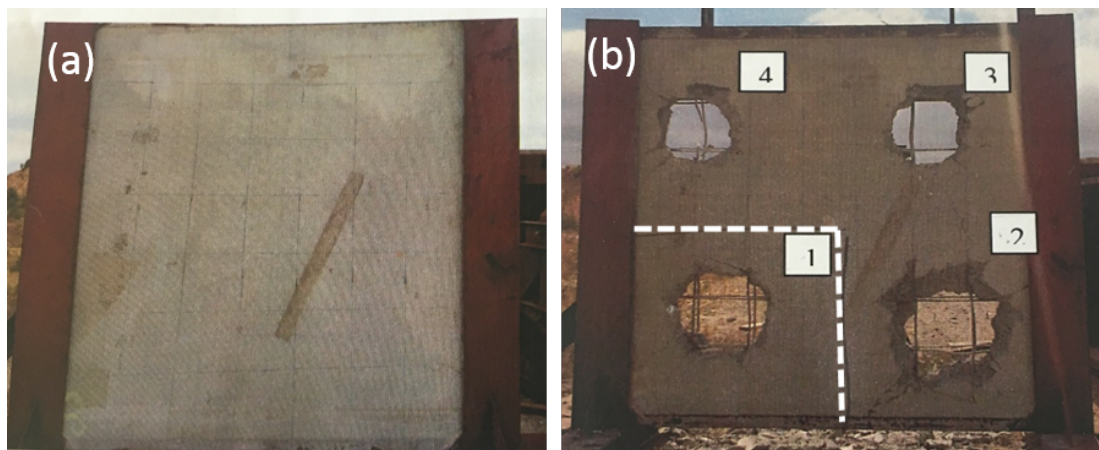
Reinforced concrete wall before (a) and after (b) the shots.
